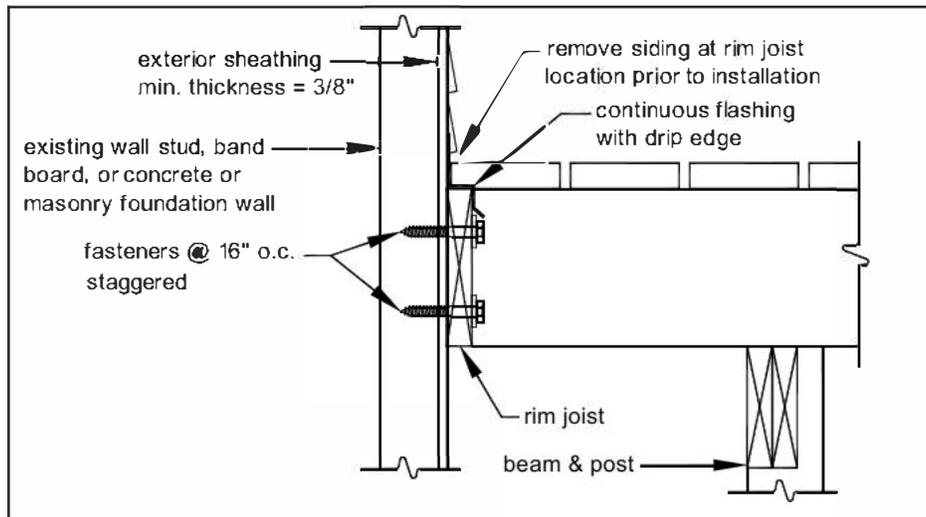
ATTACHMENT TO HOUSE LATERAL SUPPORT
